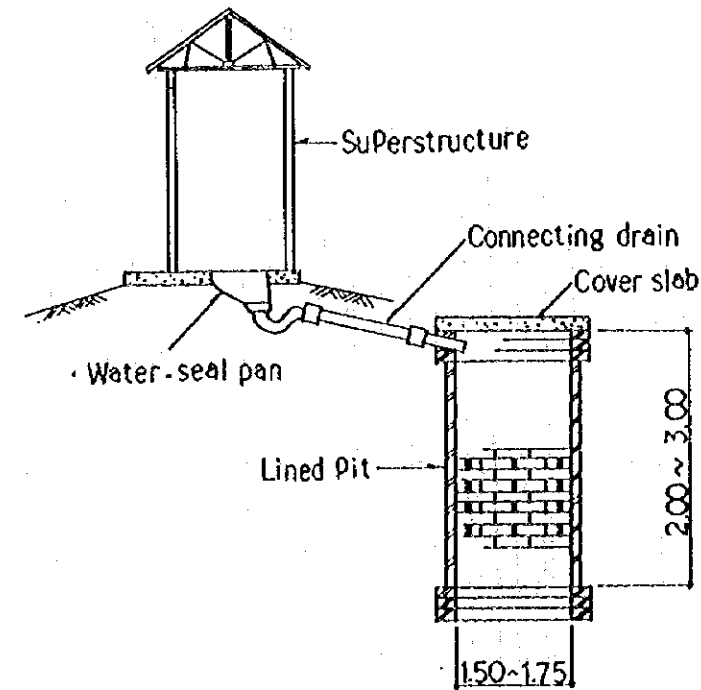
Layout of Household Waste Water Disposal Pit & Toilet
